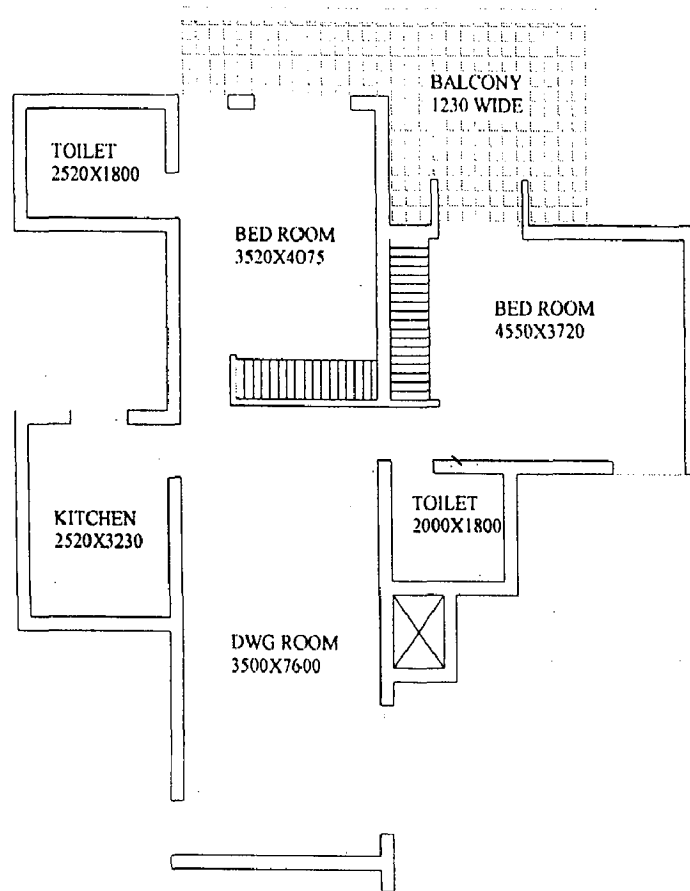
UNIT PLAN (MAYUR VIHAR)
